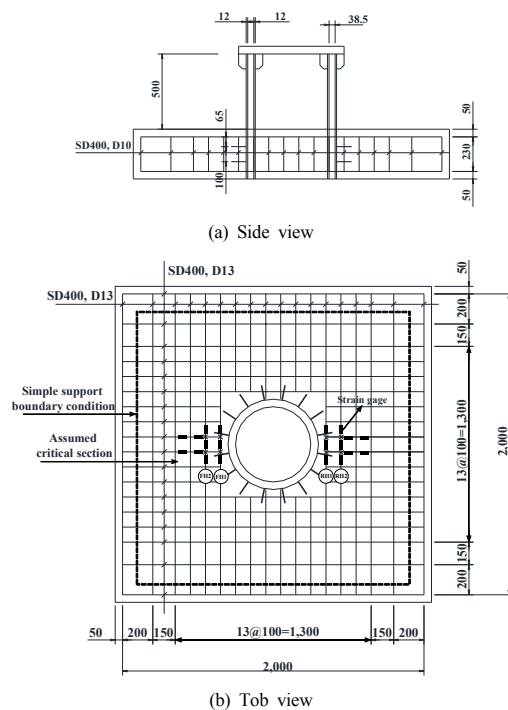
Dimensions of test specimen SC-AL-S100 & SC-EL-S100
